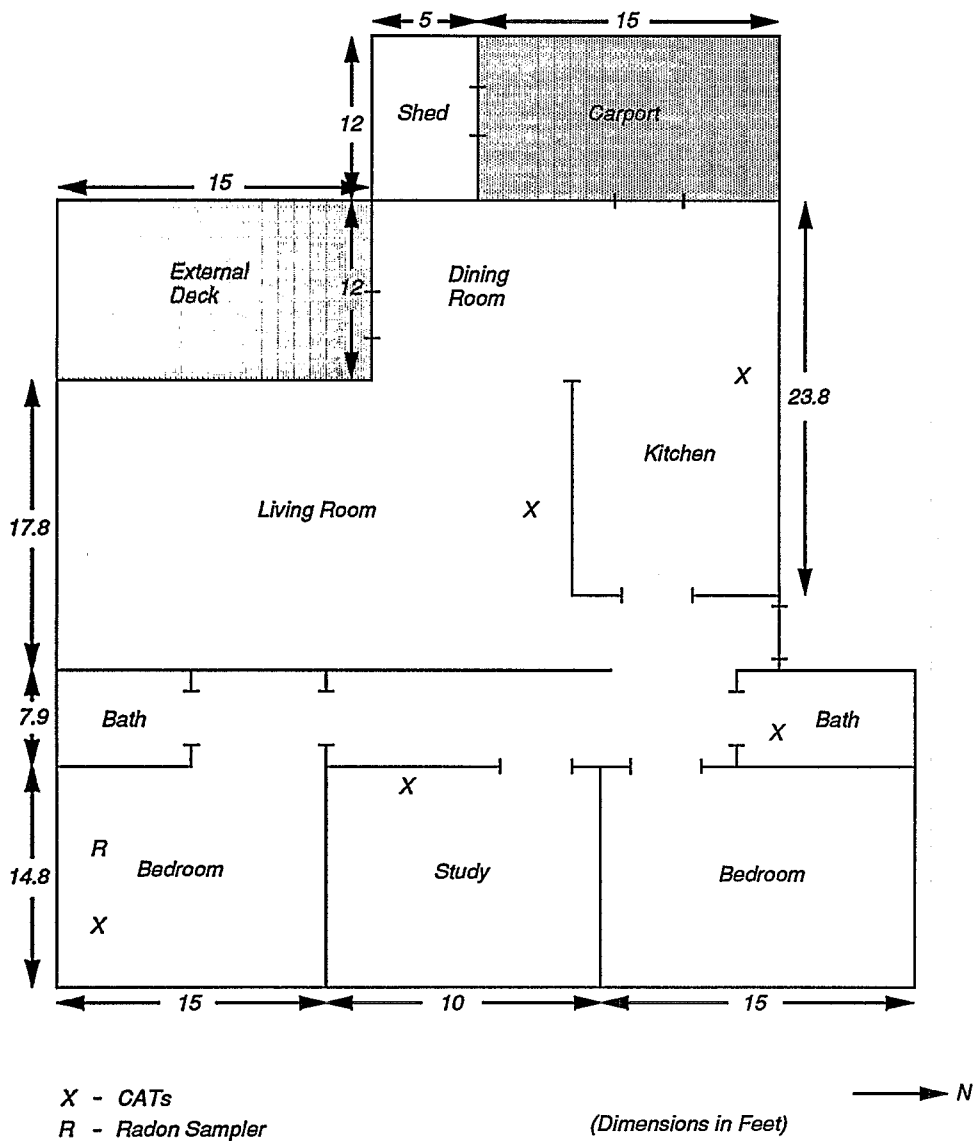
Upstairs floor plan of PU21 showing CATs and radon sampler.
